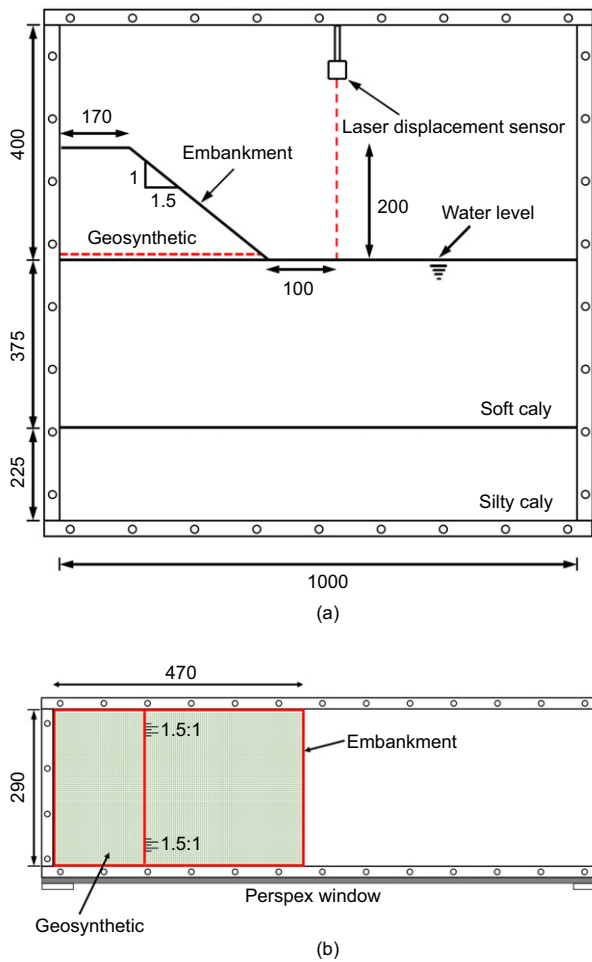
Schematic view of embankment model (units: mm): (a) side view; (b) plan view
